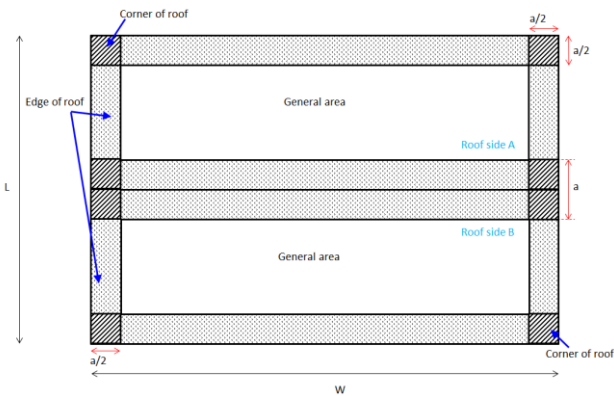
Plan view of the roof with different pressure zones ( $a=6300$  mm)
